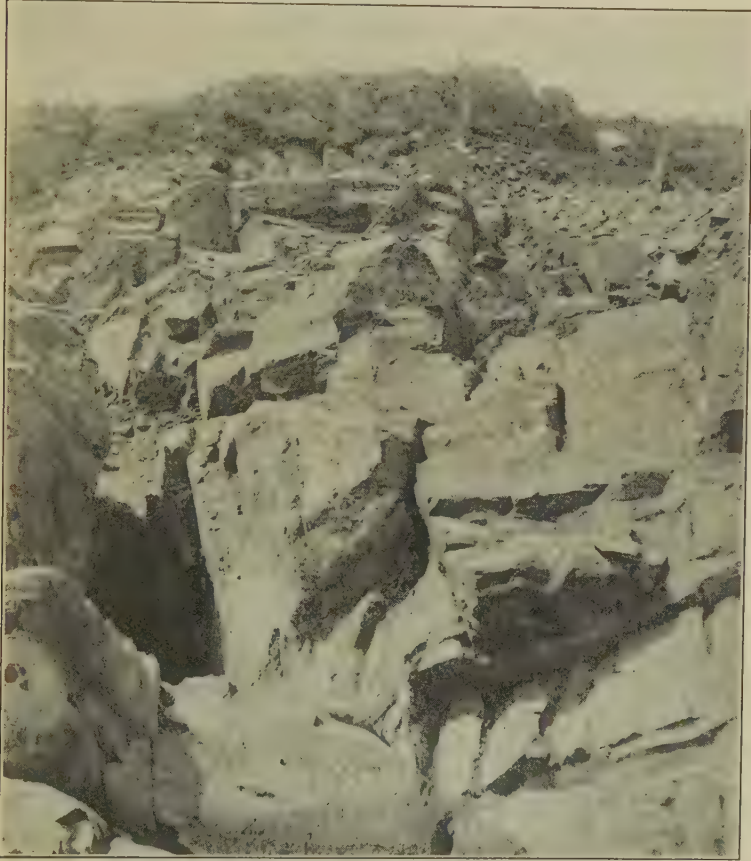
A SECTION OF PREPARED FOUNDATION.
